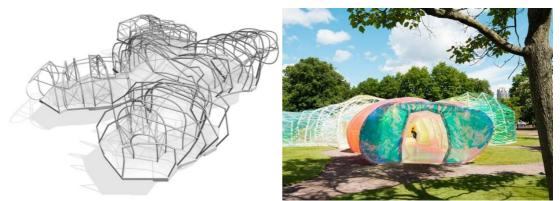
Isometric view, 15th Serpentine Pavilion, Photo: Iwan Baan.
